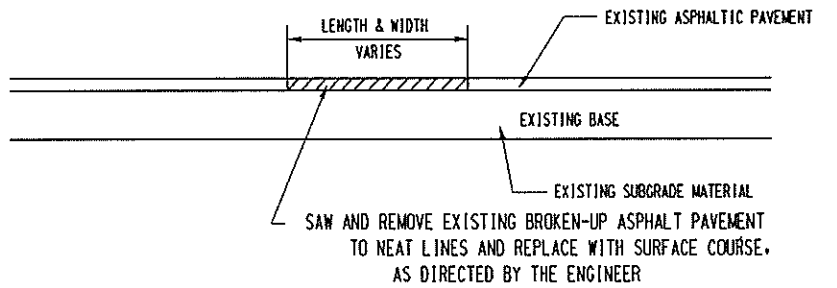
DETAILS OF REPAIRING EXISTING PAVEMENT PRIOR TO RESURFACING FOR FULL DEPTH AND MILLING
